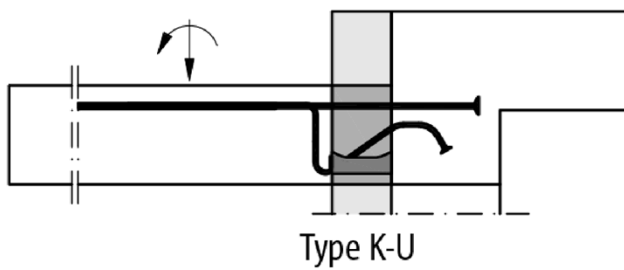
Schöck Isokorb® Type K-U, K-U-F for freely cantilevered balconies with height offset downwards or wall connection
